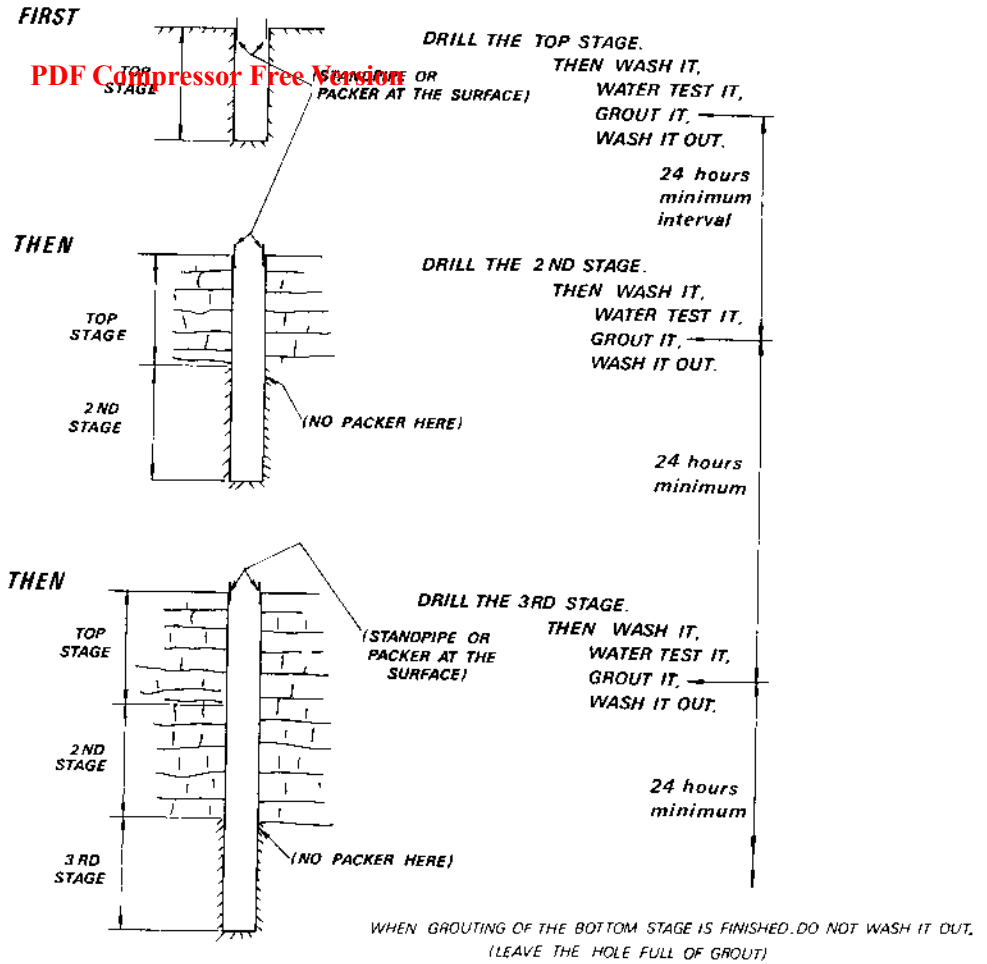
Grouting downstage without packer (Water Resources Commission 1981).
